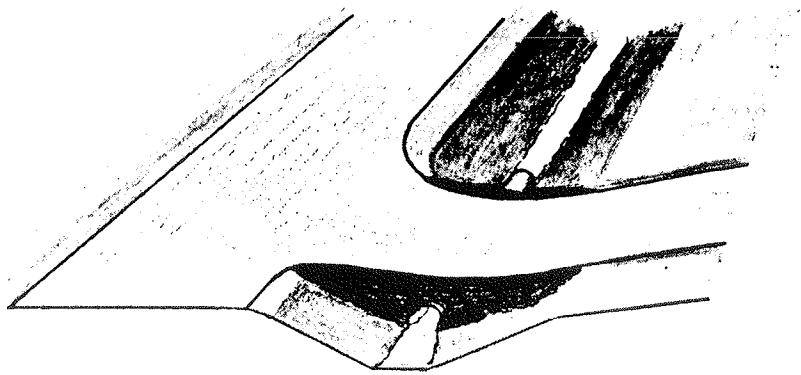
An excellent example of a continuous ditch is shown here. Note culverts (top center) under each driveway, paved lining on steep sections, and the outlet to the stream.
